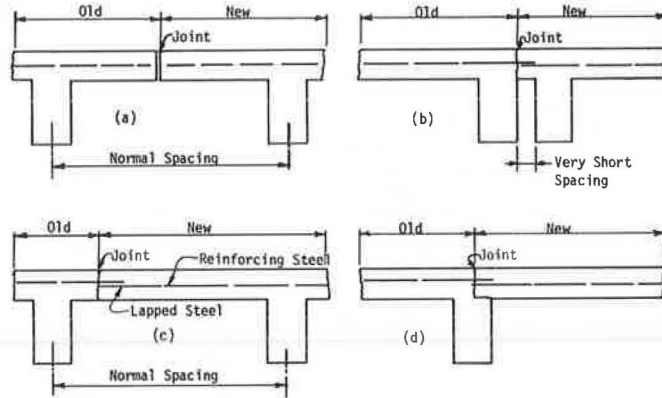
Relative movements between old and new concrete when traffic moves across bridge.
